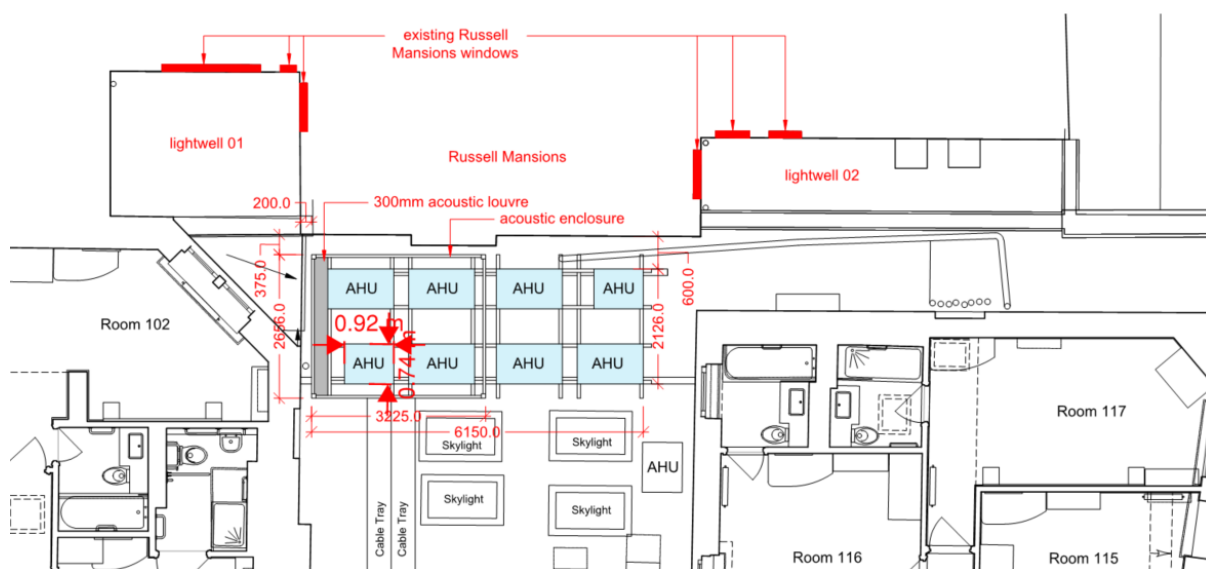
Proposed first floor plan showing location of condensers (as installed) with locations of residential windows shown in red
